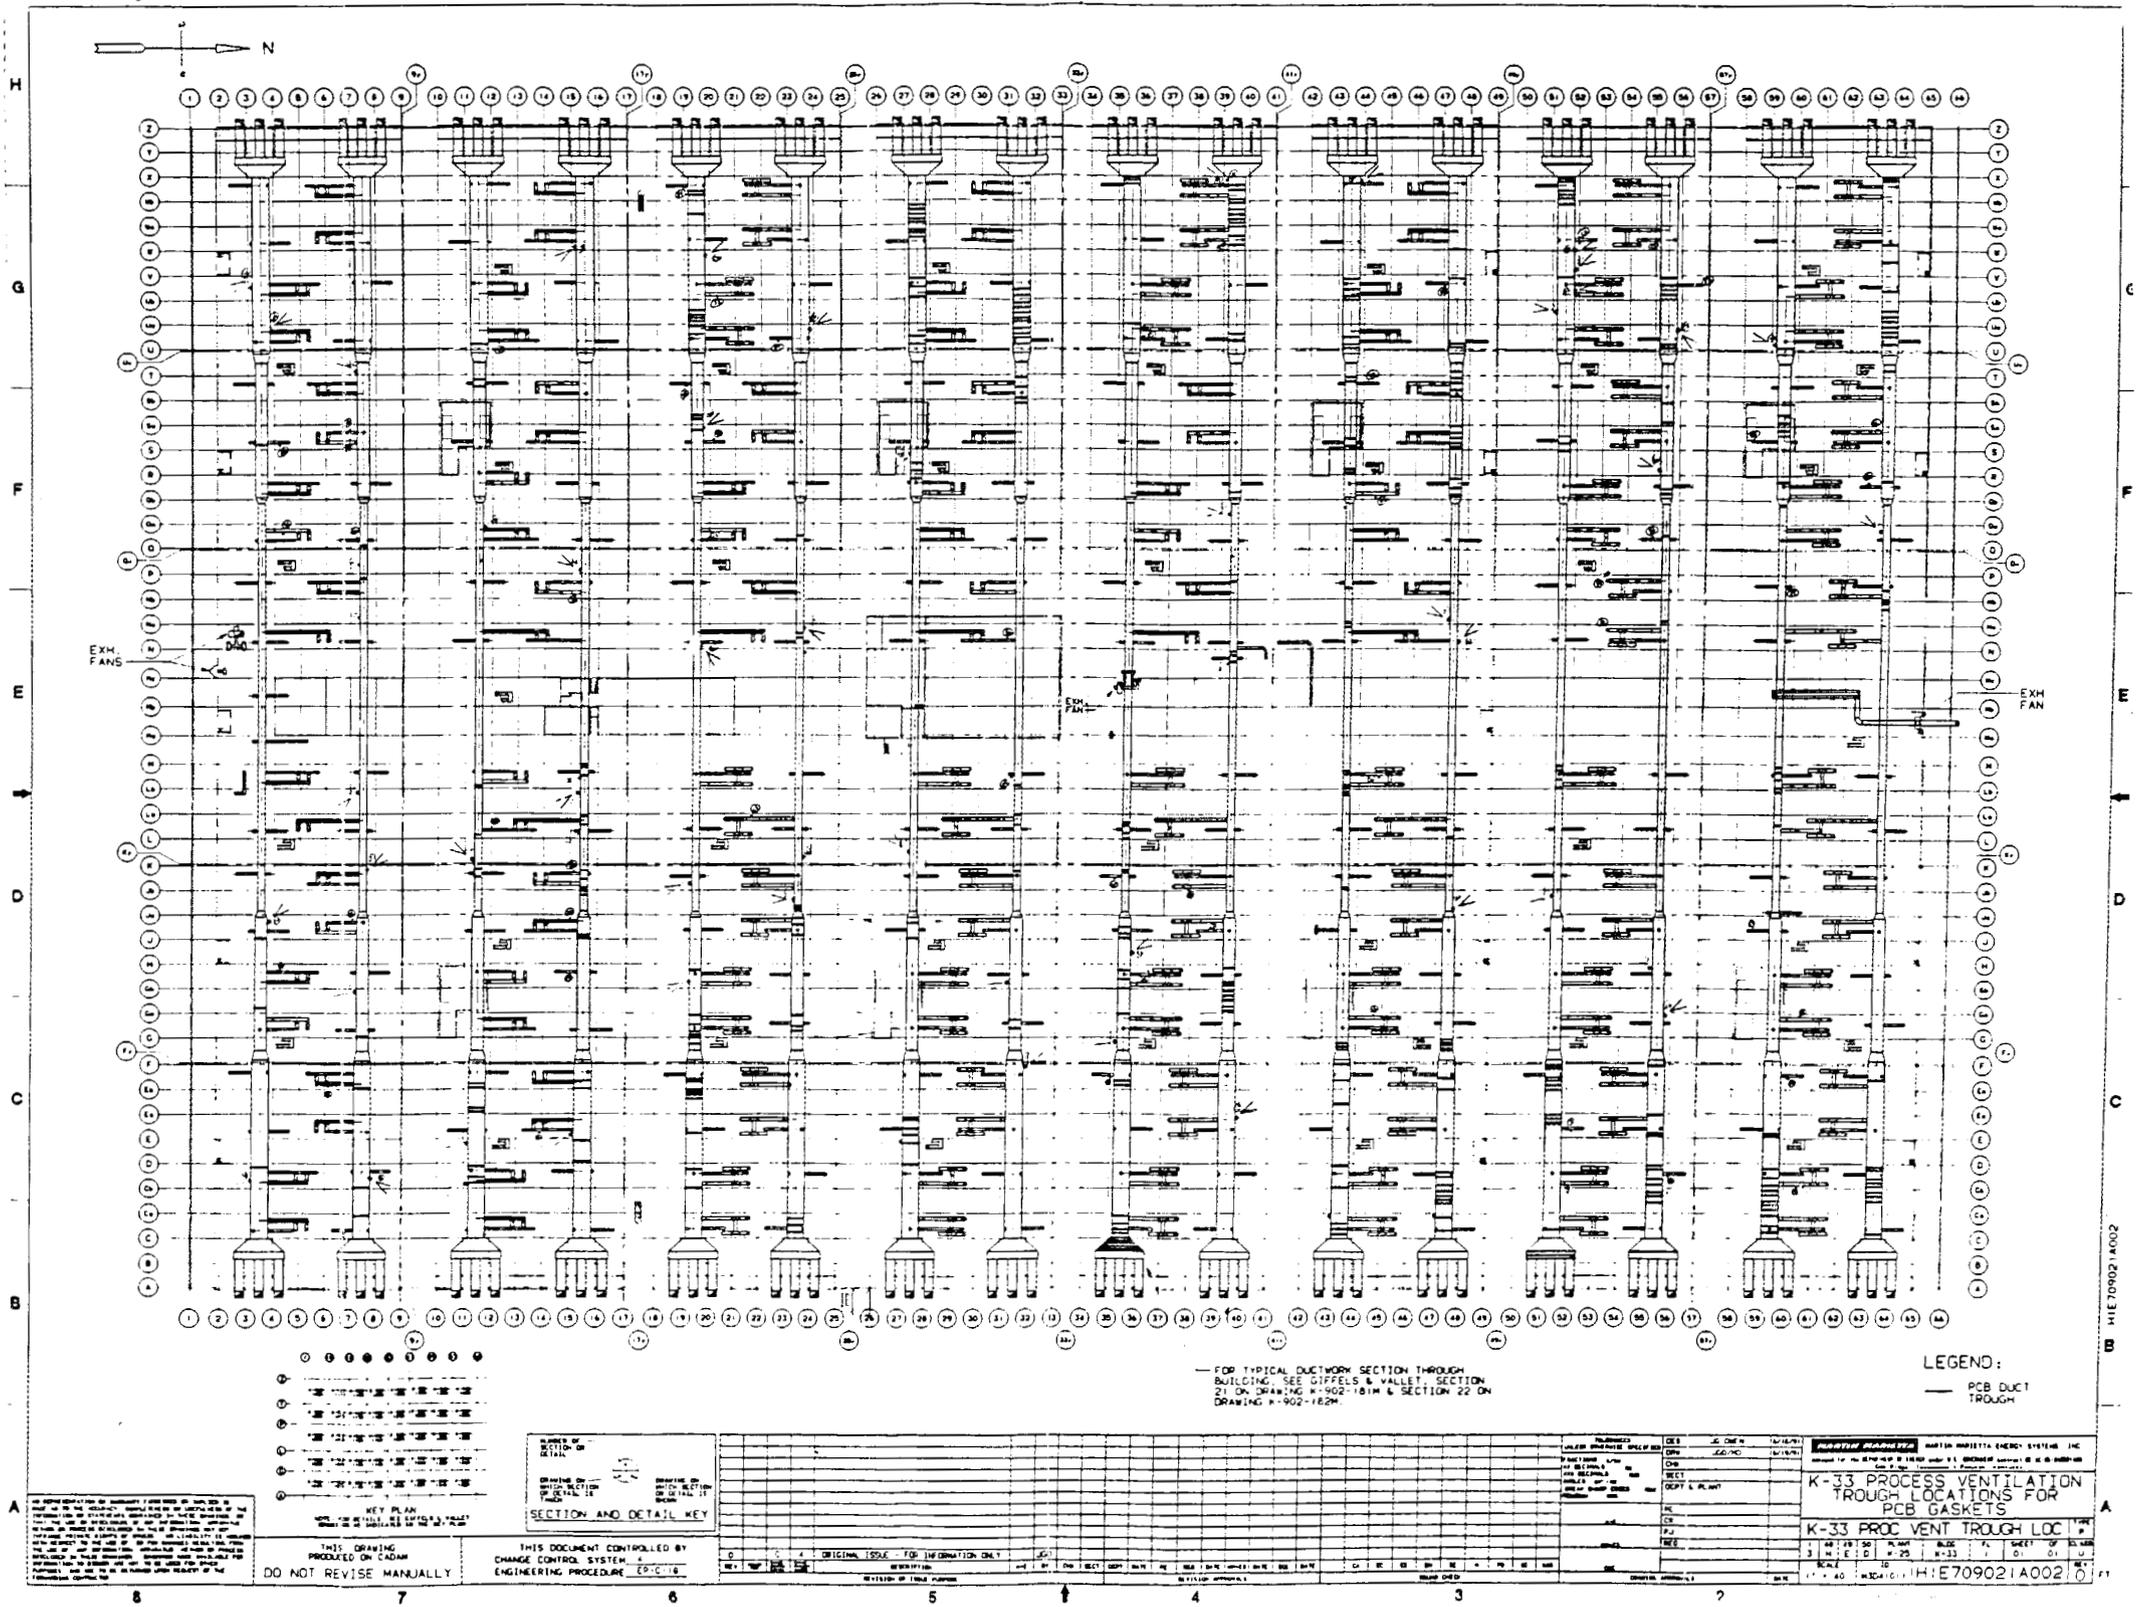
Layout of main plenums and side laterals in Building K-33, showing column numbers.
